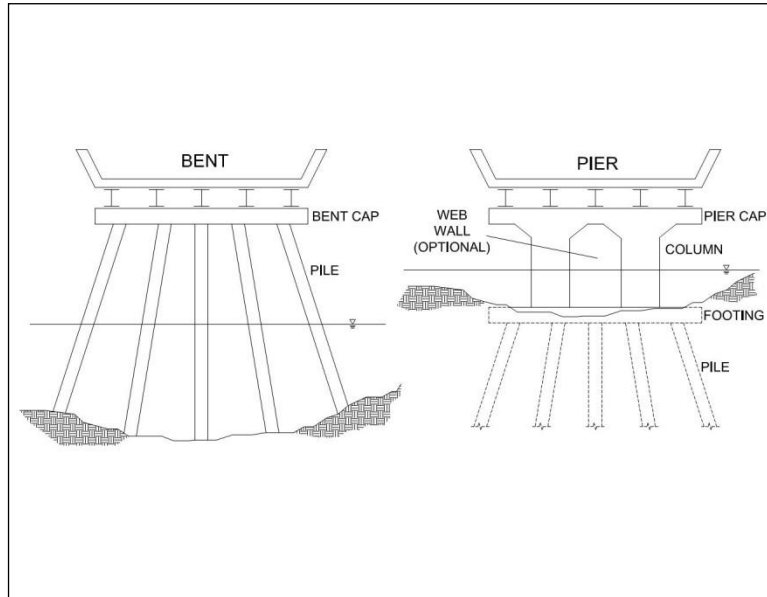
Diagram showing differences between a Bent and Pier
